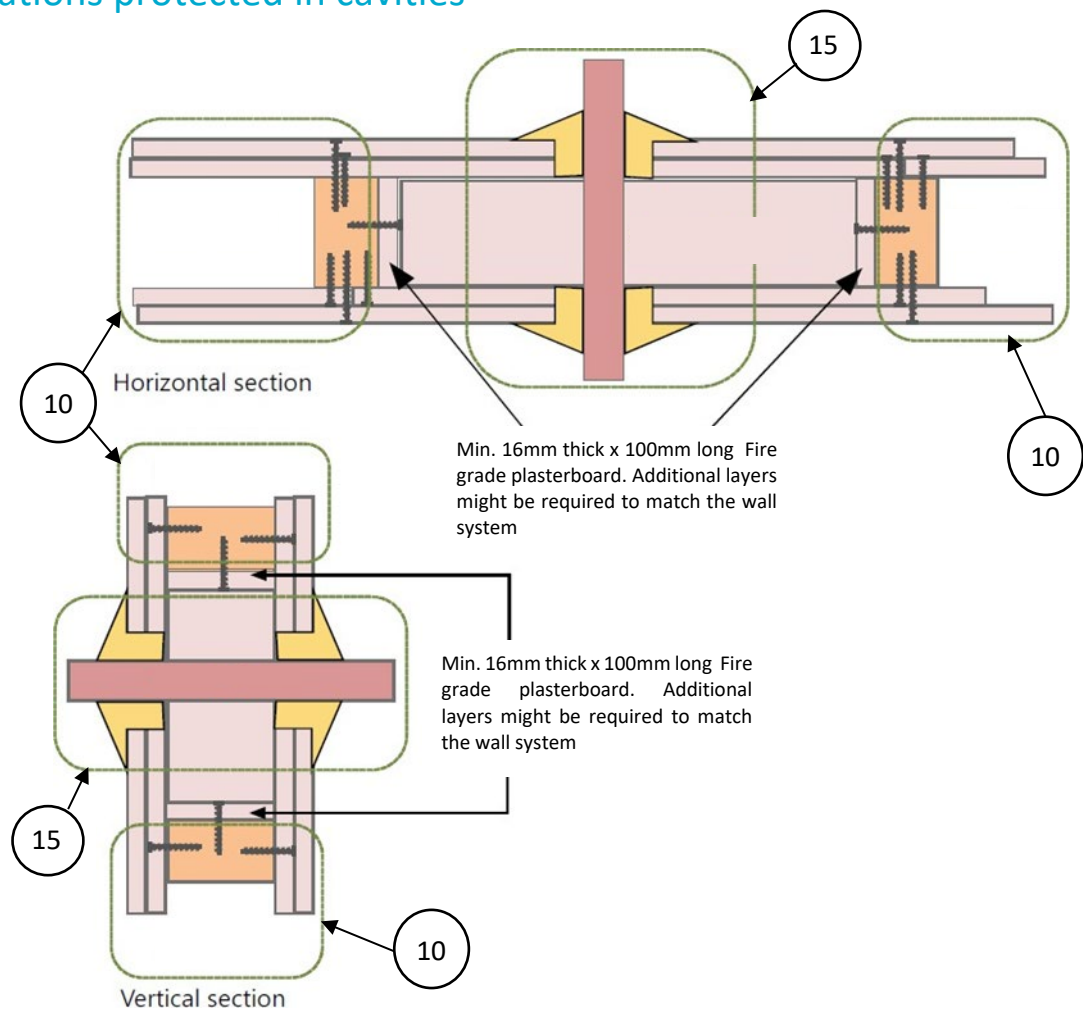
Framed out service penetration for pipes and cables – Plan and section view
